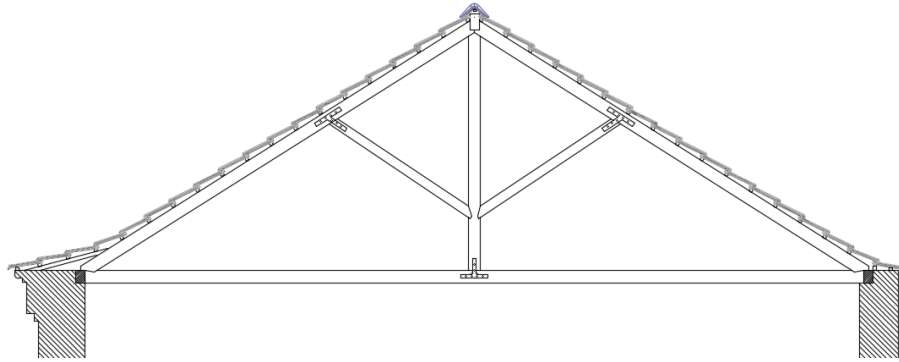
Example of a triangular roof type cut section – Adapted from (Mascarenhas, 2004)
